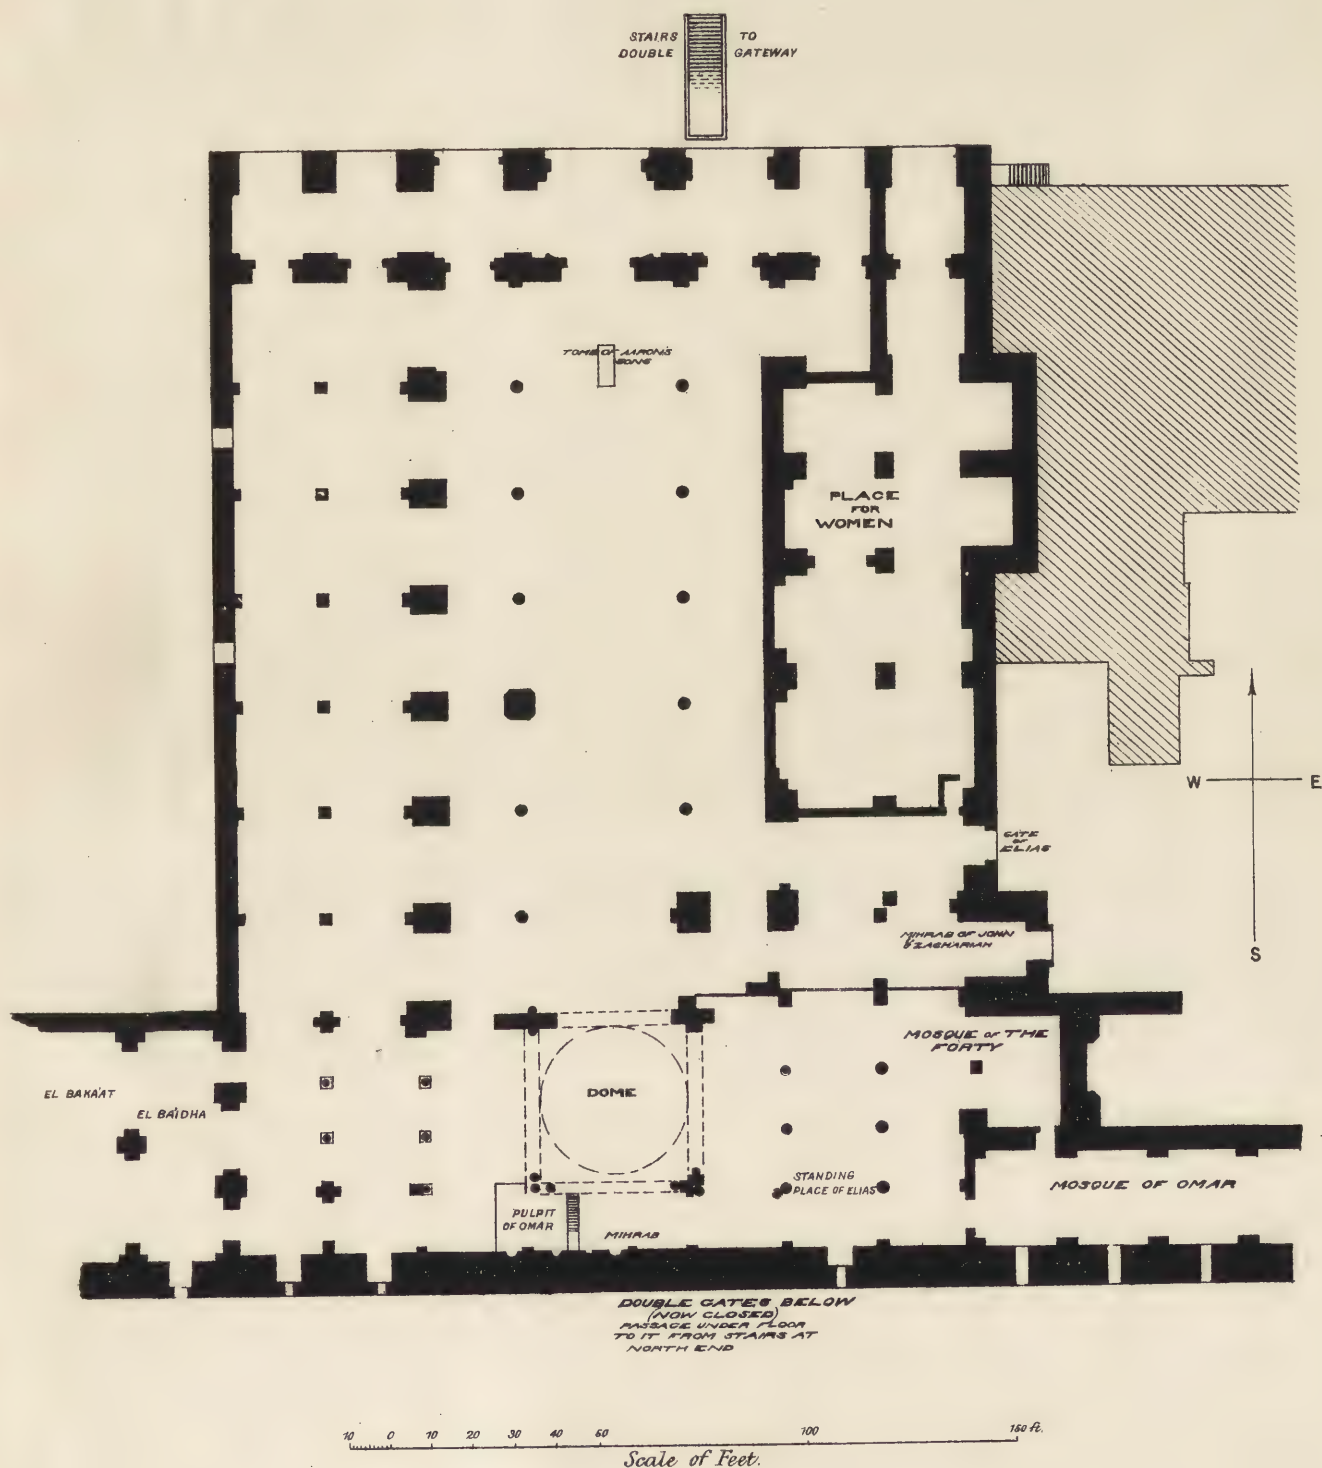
PLAN OF THE AKSA AT JERUSALEM.
